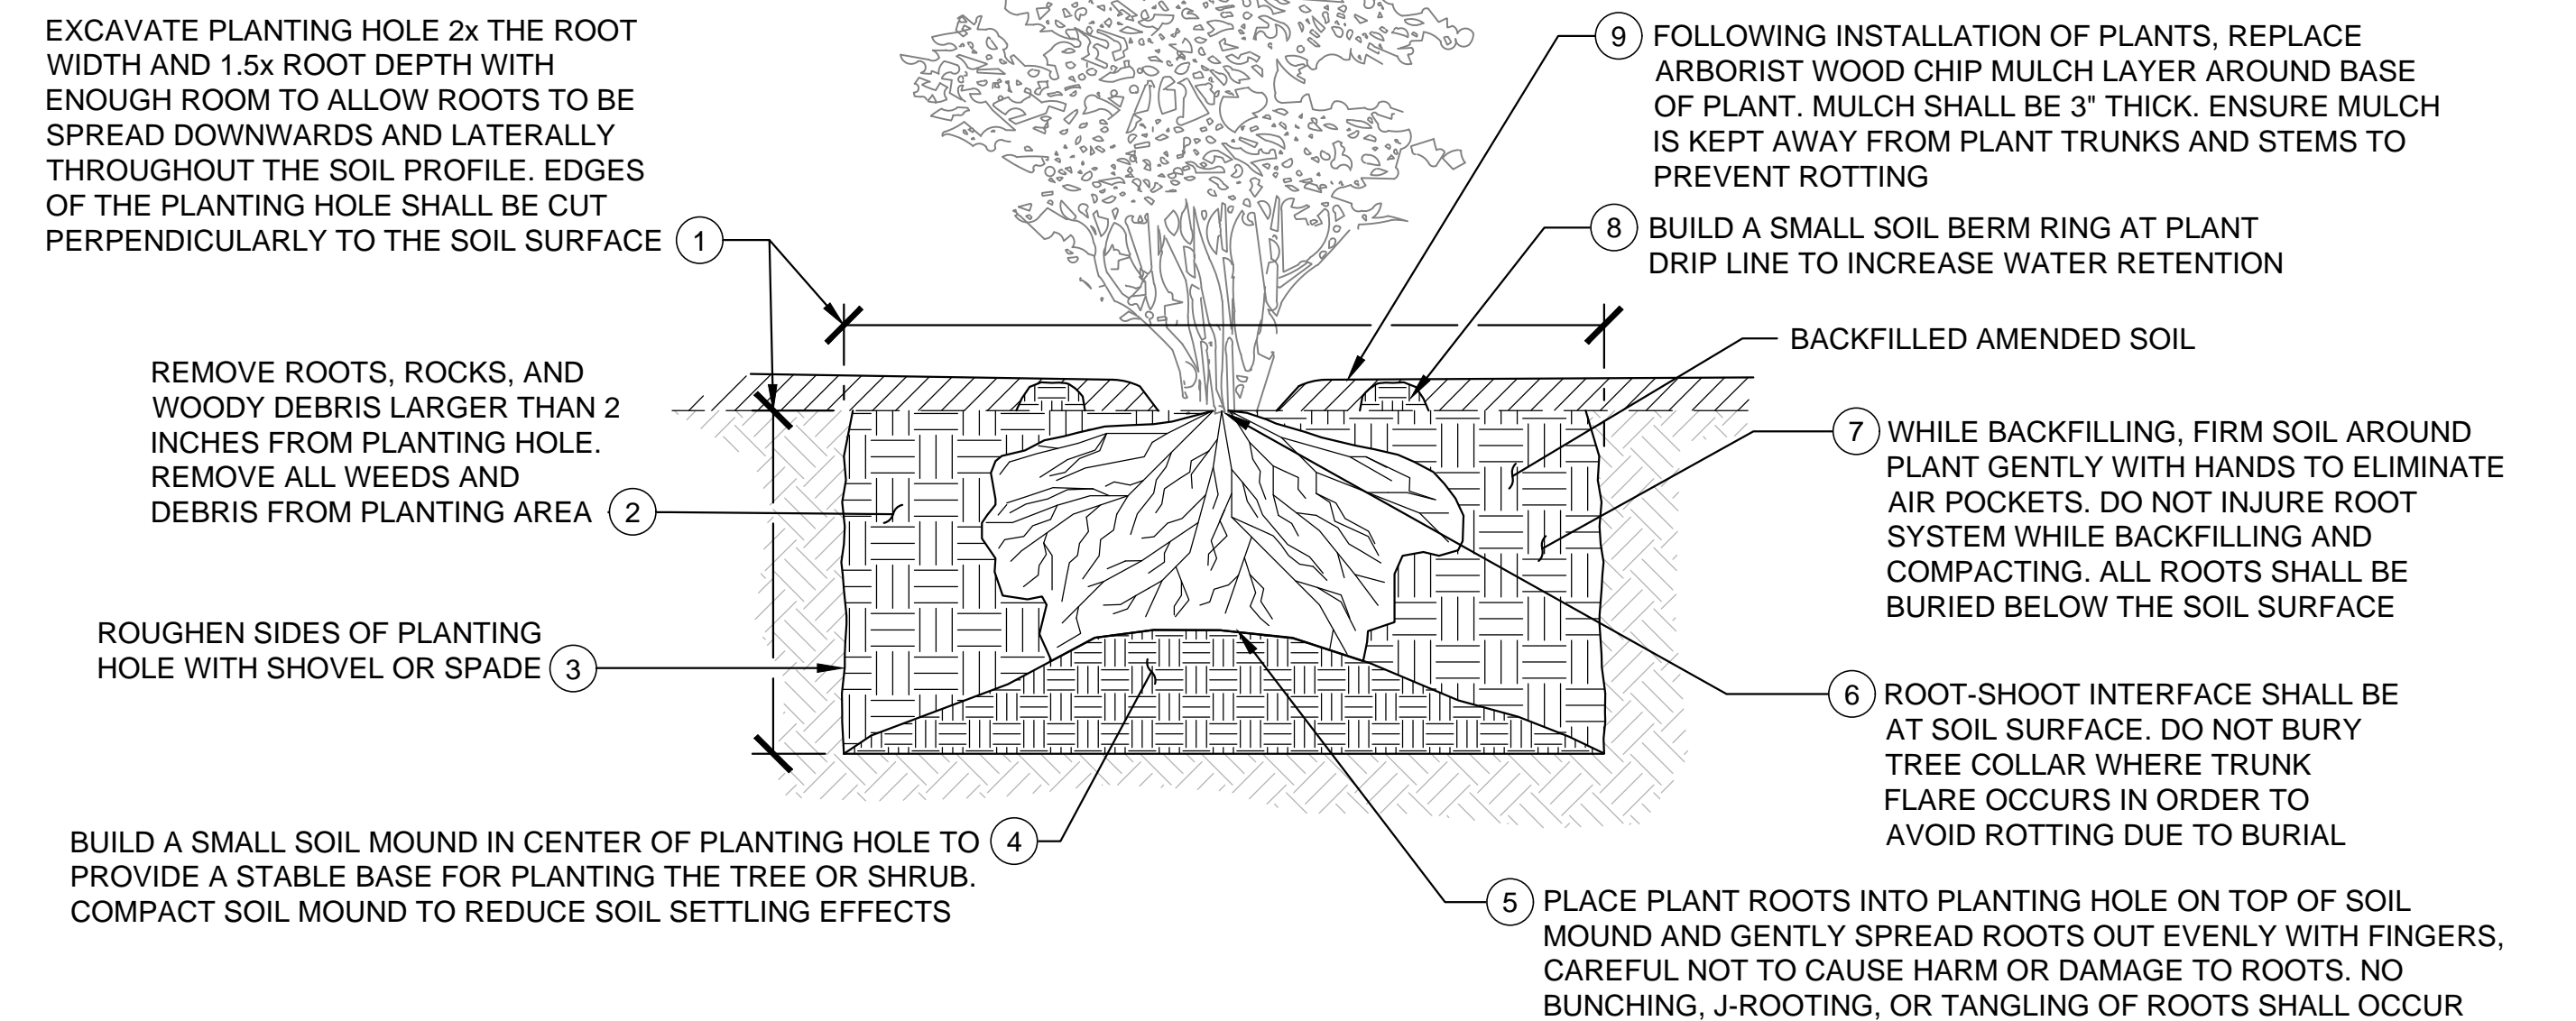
DETAIL - CONTAINER TREE AND SHRUB PLANTING
